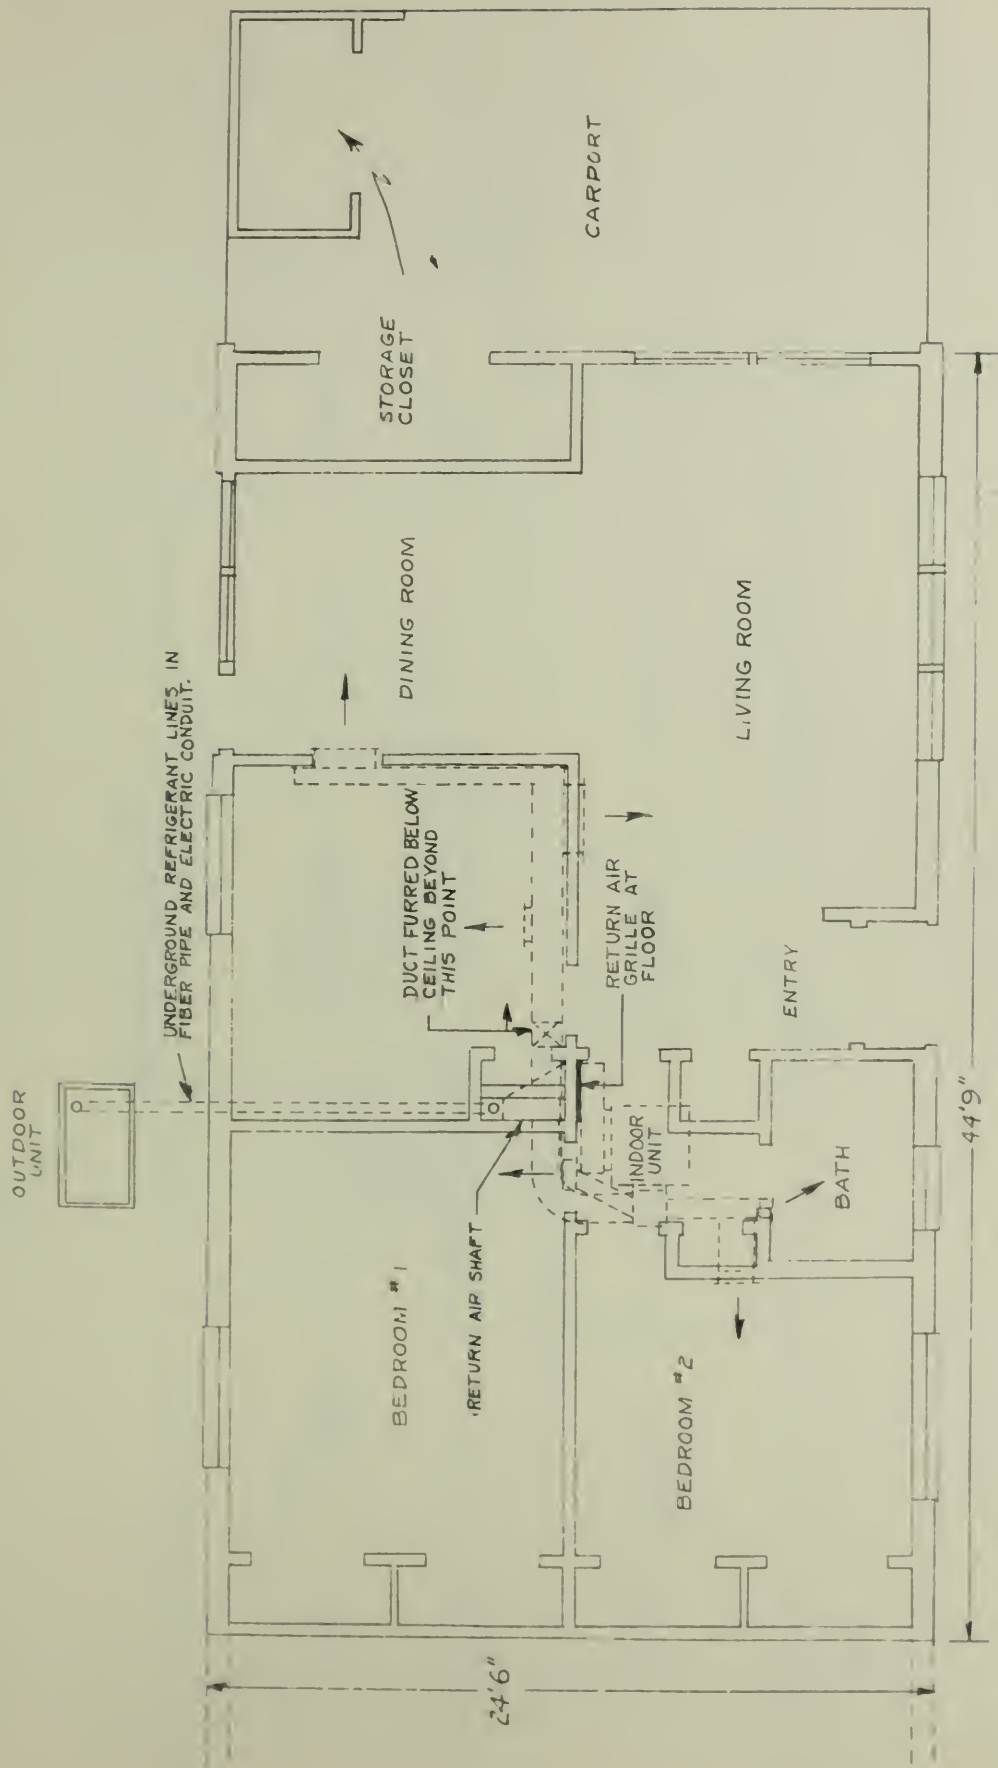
Plan View of Type C House, Seymour Johnson Air Force Base
